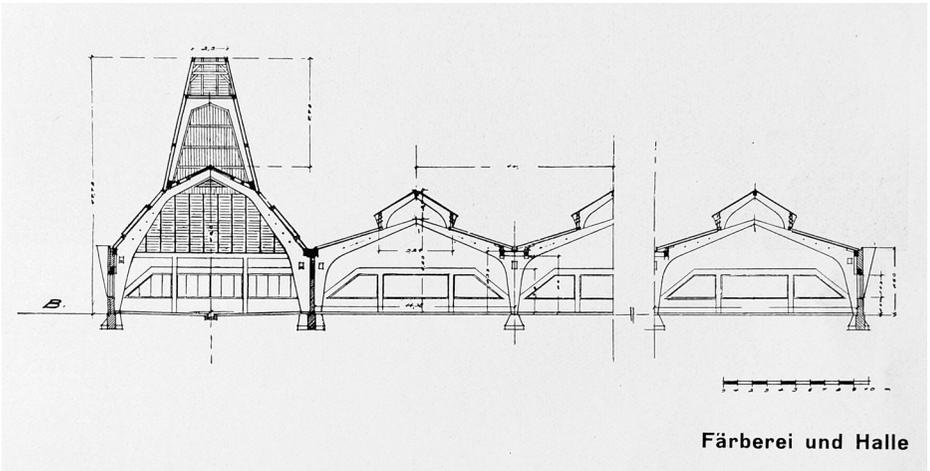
Cross section through the dye works and manufacturing sheds. Erich Mendelsohn, *Das Gesamtchaffen des Architekten: Skizzen, Entwürfe, Bauten* (Berlin, R. Mosse, 1930), p. 65.
